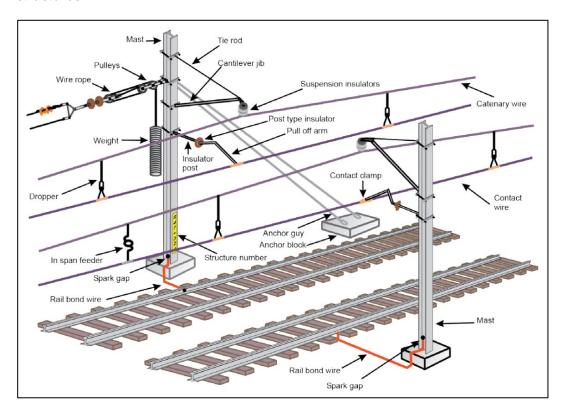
Simple catenary, regulated tension, cantilever construction on masts
